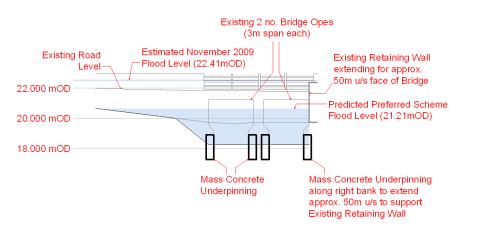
Proposed Works at the By-Pass Channel Bridge in Craughwell
